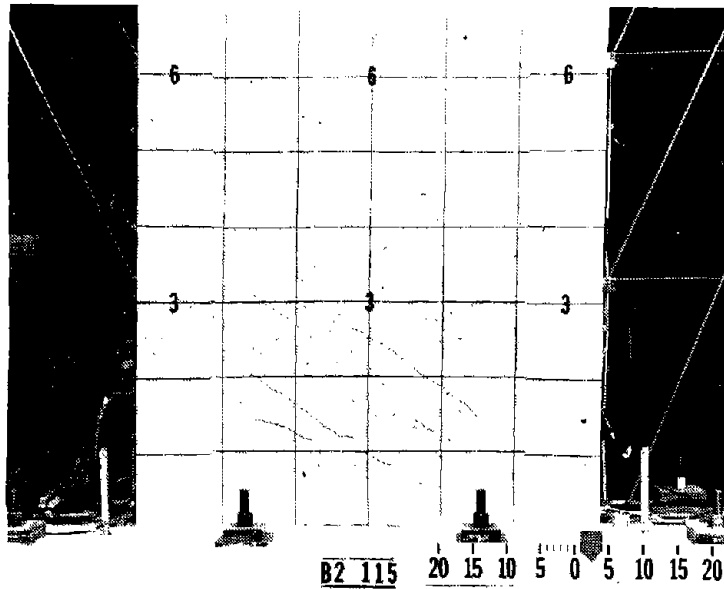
Cracking Pattern at +3 in. Deflection for Specimen B2
